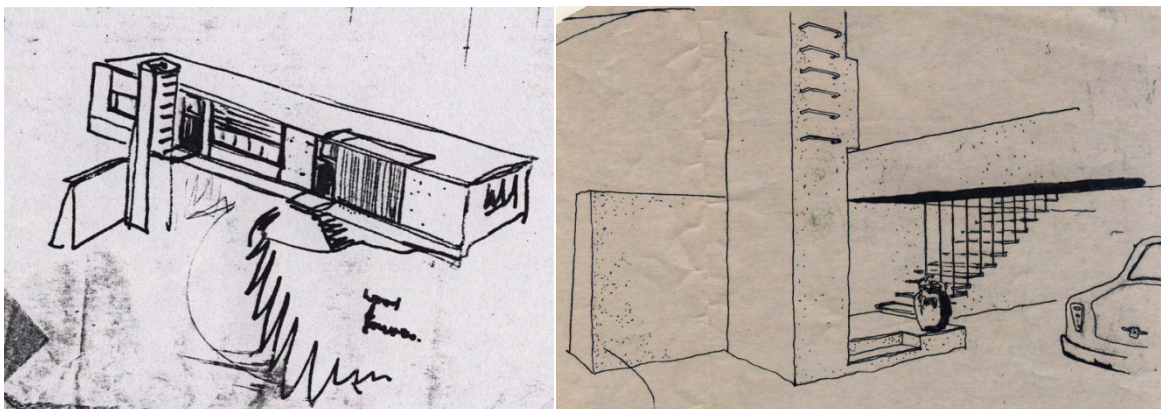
Fagan's sketches for House Bertie-Roberts (1965) showing supporting role of chimney on left and access on right (Fagan archive - Job No. 644, undated).
